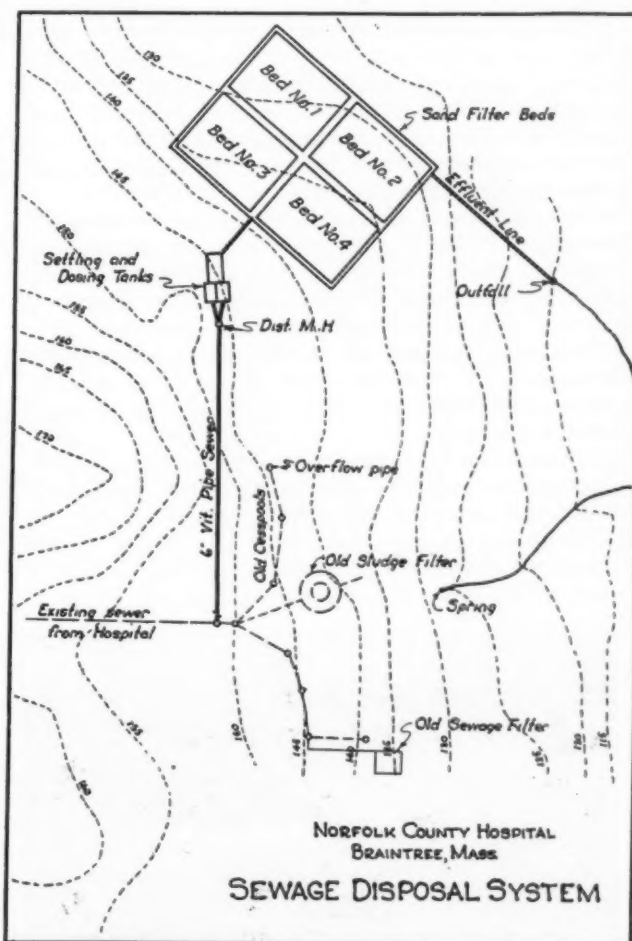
GENERAL PLAN OF SEWAGE DISPOSAL PLANT
